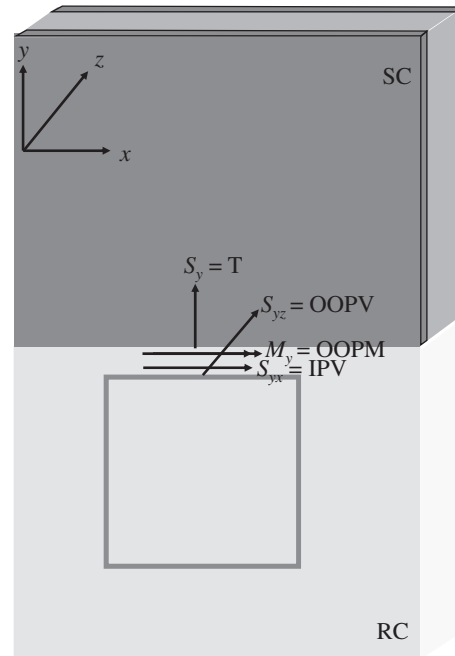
Four forces on RC wall panel to be transferred to SC wall.
